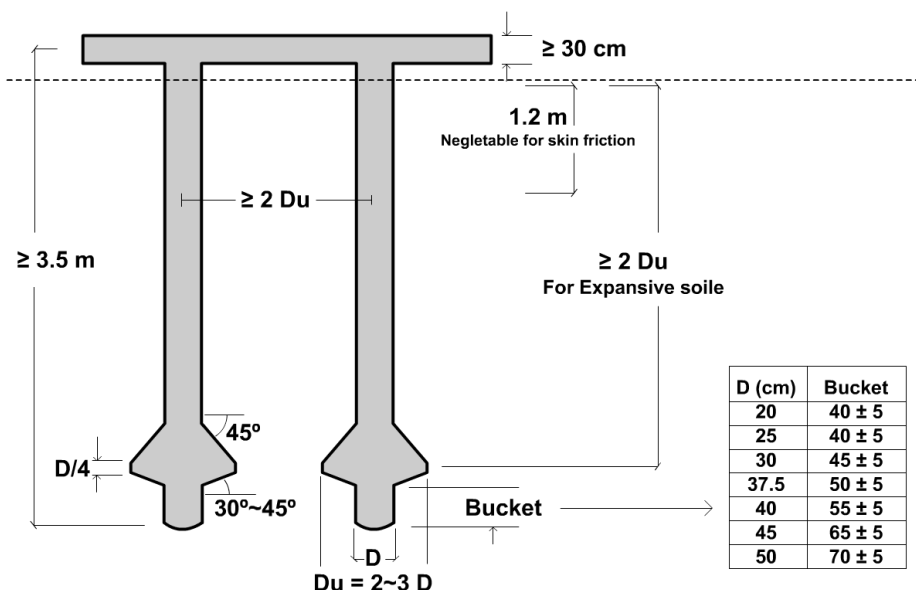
Schematic section of considerations for Under-reamed piles is group [1].
